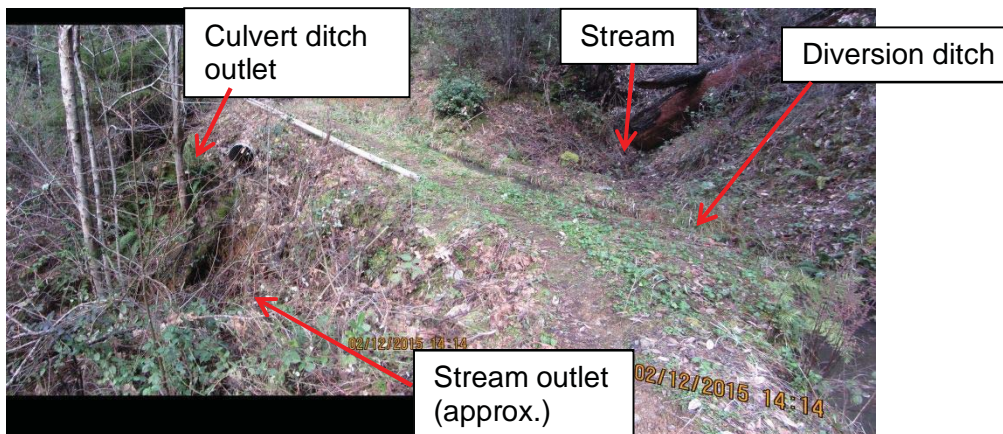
at Point 5, shows the shotgunned 12-inch ditch culvert outlet, diversion ditch and native stream channel flowing under the diversion ditch. (Photos 8442, 8443, 8444, 8445 composite)
